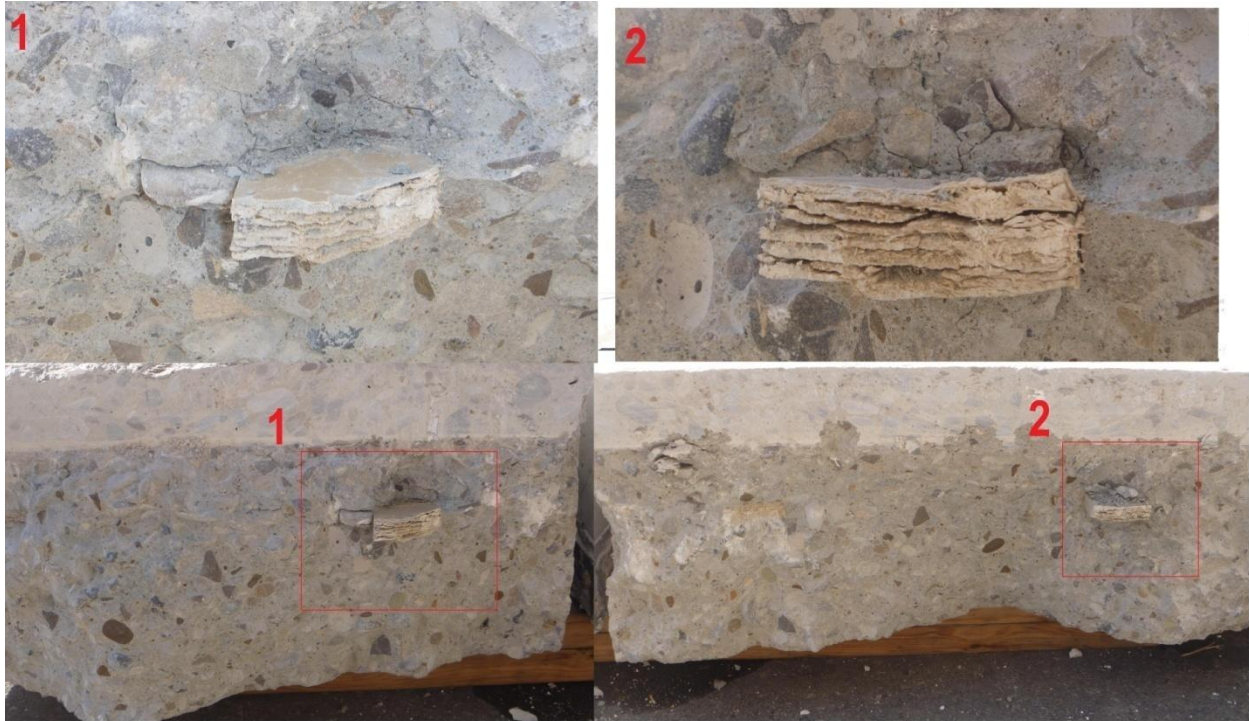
Misaligned GFRP Tapered Plate Dowel Specimen: Joint and Device Condition at Failure
